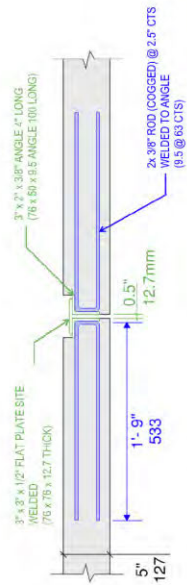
Typical pre-cast panel-to-panel joint connection detail (joint parallel to direction of span)
